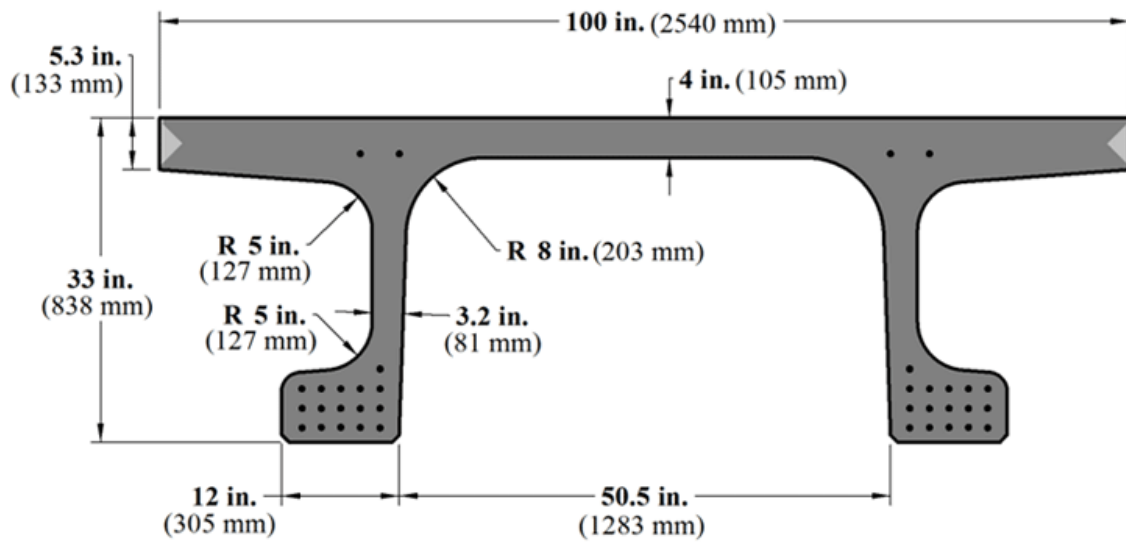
Cross-section of pi-shaped girder used in Jakway Park Bridge (FHWA, 2013)
